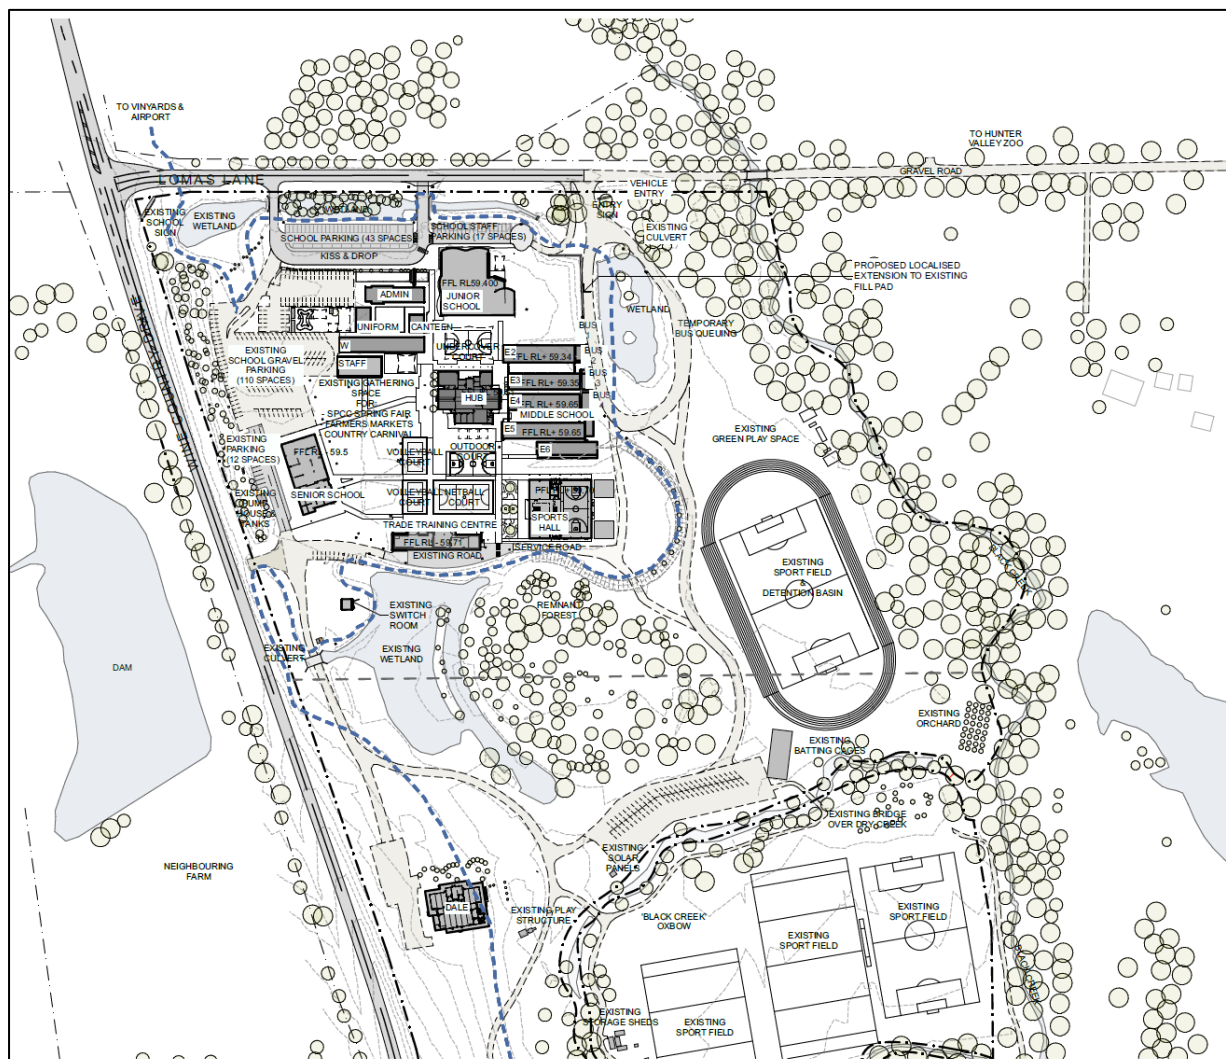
Existing Site Plan – North. Source: SHAC 2022
